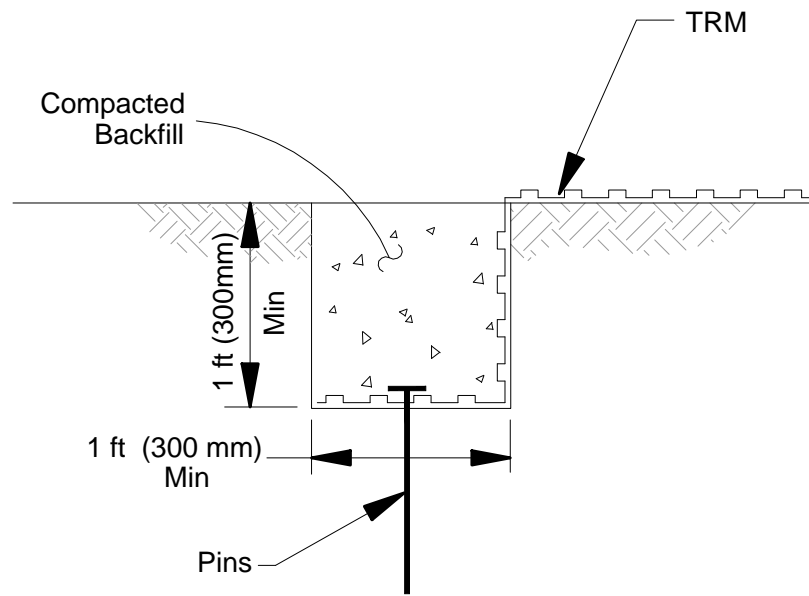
LONGITUDINAL EDGE TRENCH DETAIL
